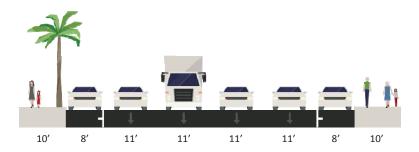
Pierce Street Typical Cross-Section, between Madison Street and Twiggs Street
